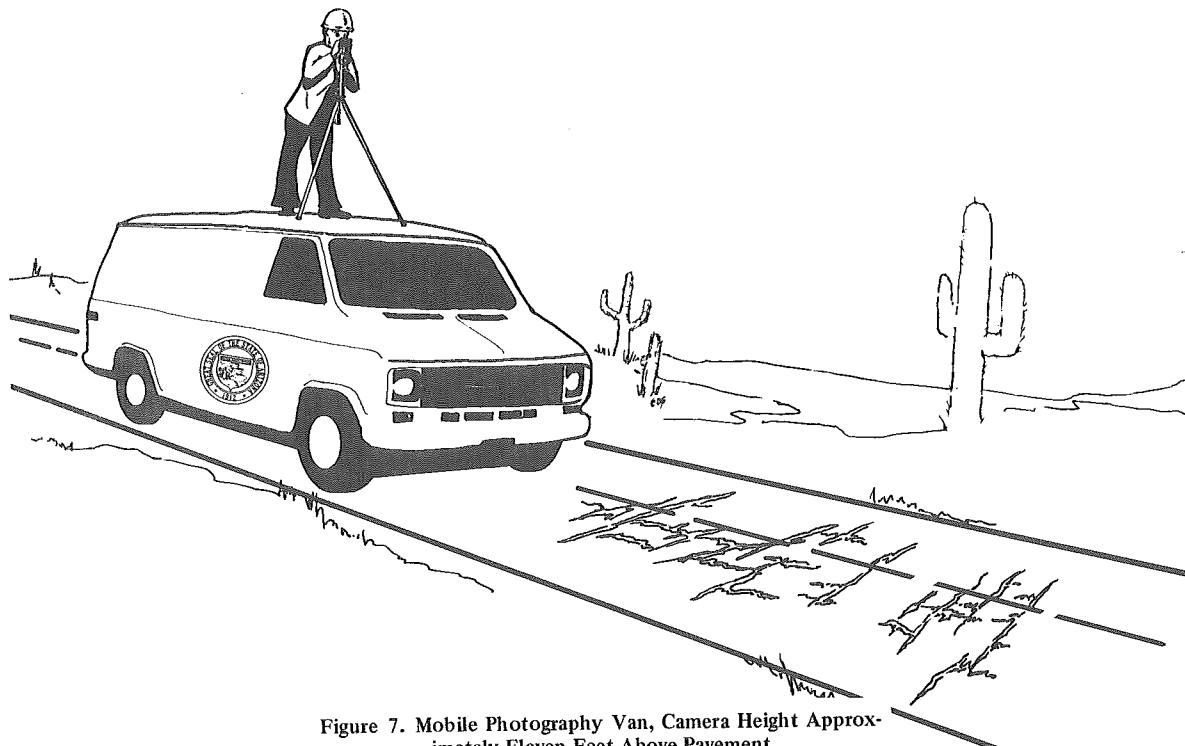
Mobile Photography Van, Camera Height Approximately Eleven Feet Above Pavement
